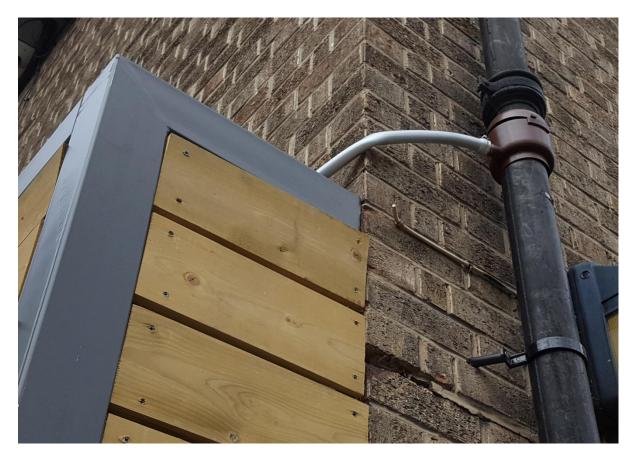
Stormwater interception mechanism that takes rainwater from the downpipe of Mary House and fills the vertical rain garden storage tank, Queen Caroline Estate, 2017. The vertical rain garden comprised a green wall, stormwater storage tank and green facade.
